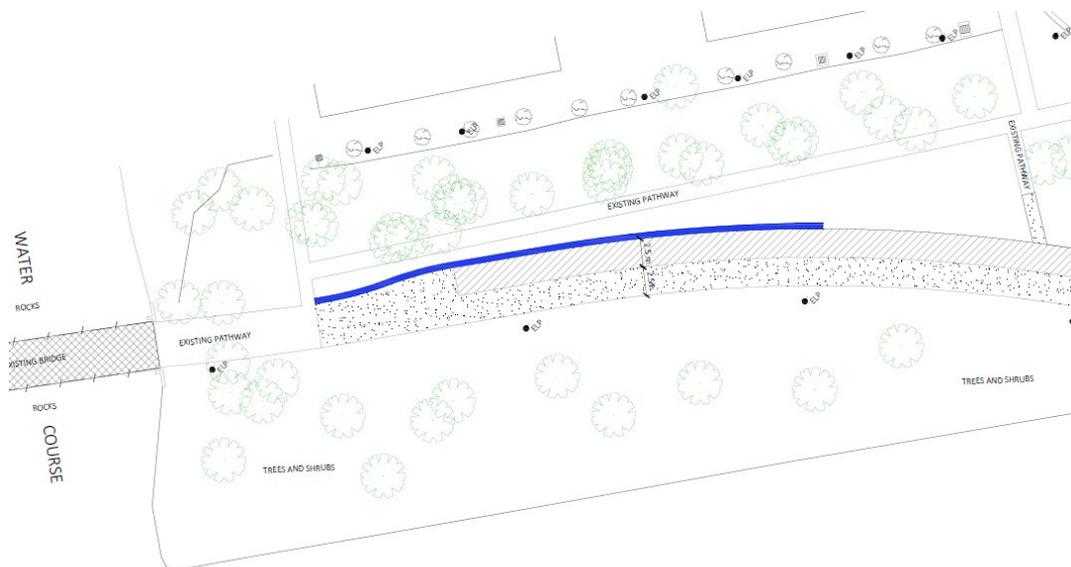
Proposed Hardworks, Boardwalks and Bridges Plan 4. Source: City of Parramatta
